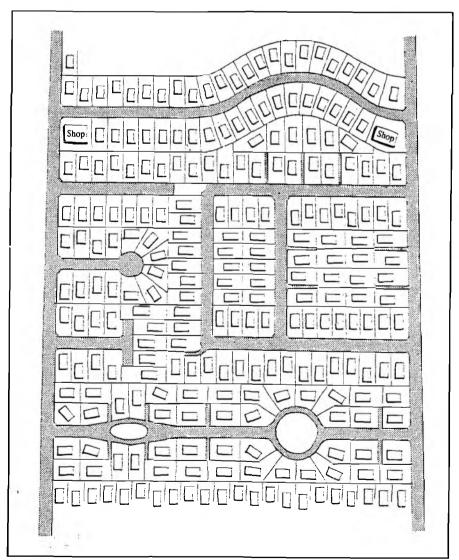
Sketch of Cloetesville street layout models (Du Plessis 1987)
